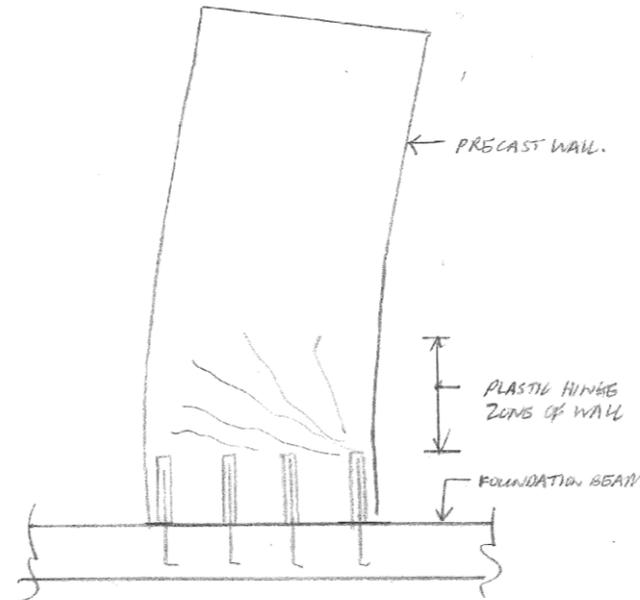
Typical Perimeter Precast Wall Hinge Zones
